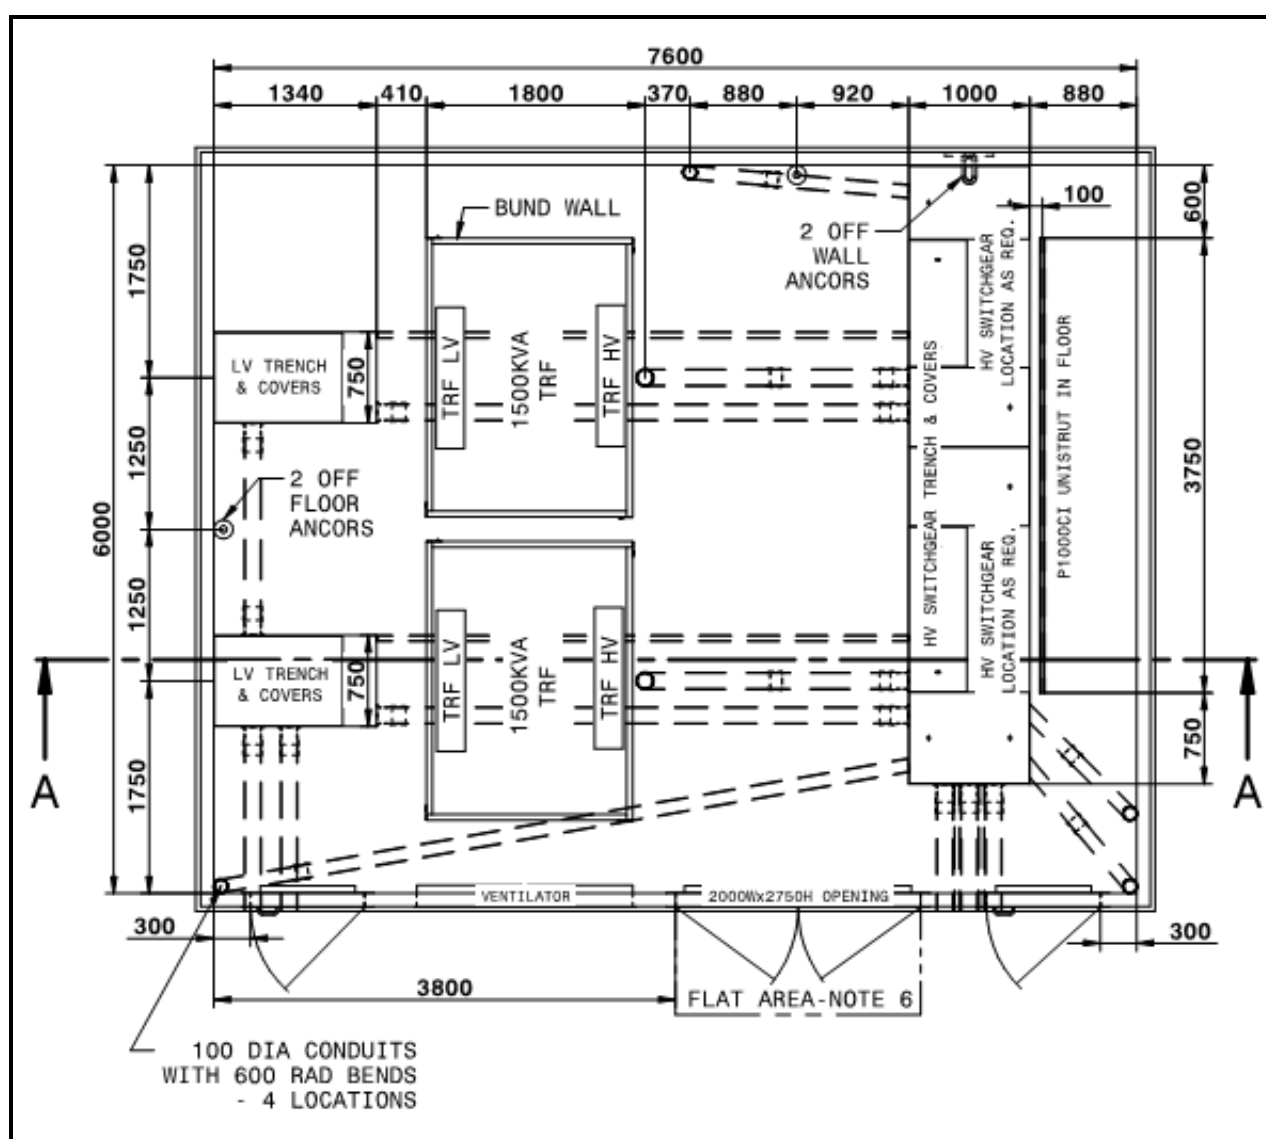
Endeavour Energy Surface Chamber Substation Layout - 2 Transformers
